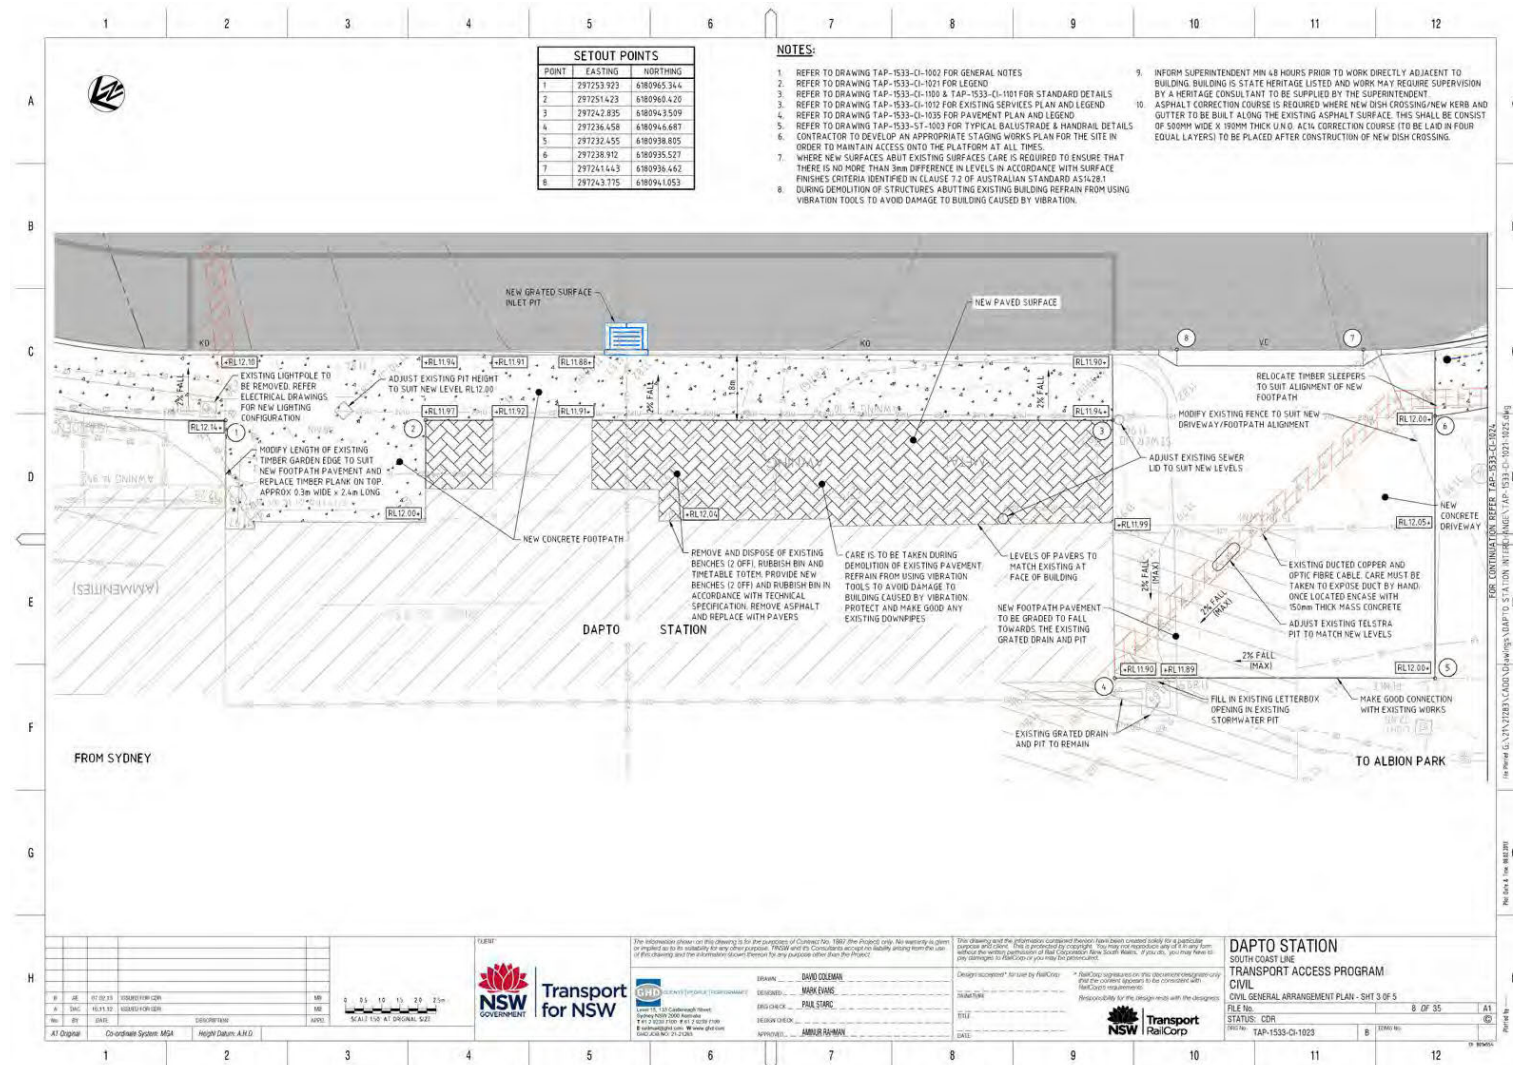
Dapto Station Transport Access Program: Detail of pavement adjacent to the main station building (Source: TfNSW, TAP-1533-CI-1023).
